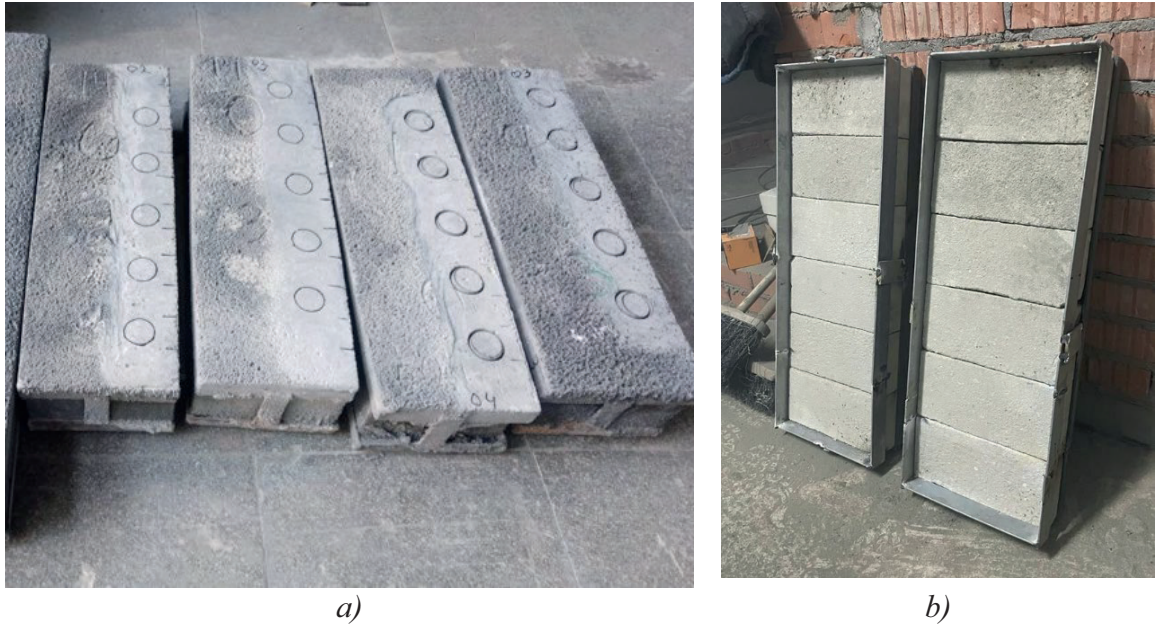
General view of specimens; specimens used to test properties (a), specimens used to test adhesion (b).
